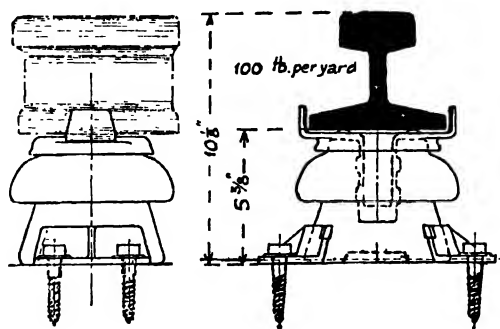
Method of Mounting "Vignoles" Type Conductor Rails.
